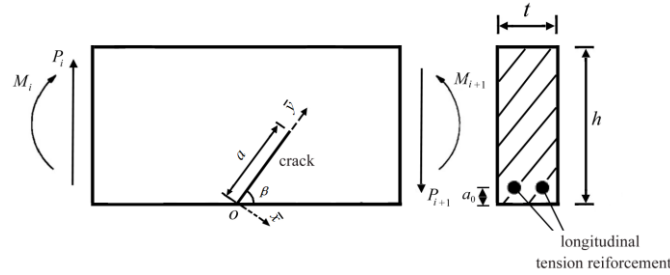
Model of cracked element in reinforced concrete beam
